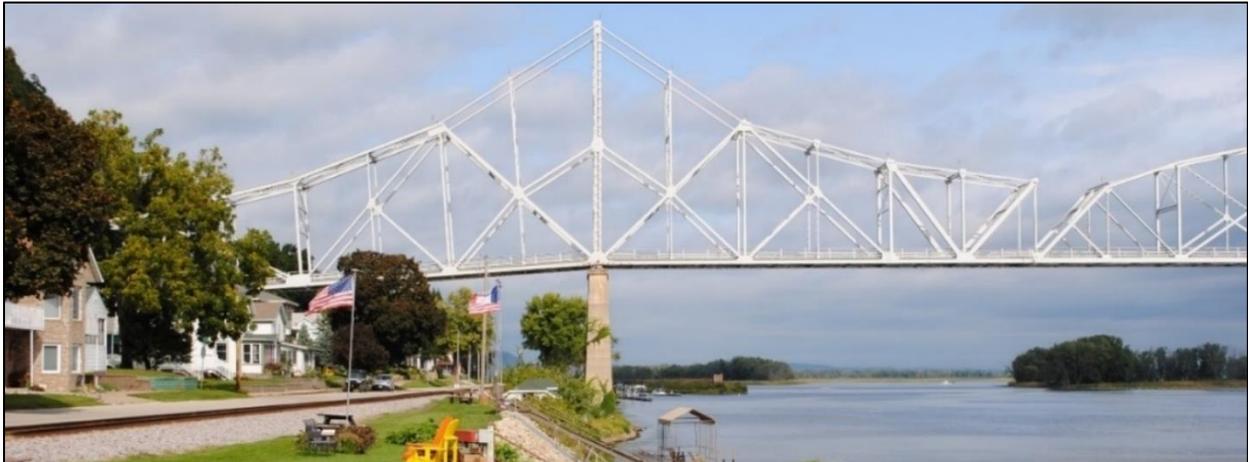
South elevation of west cantilever span, looking north from riverside park.
